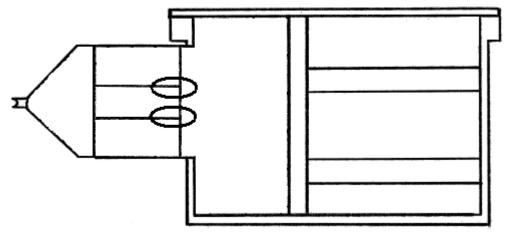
Location of the found cracks when using hardening grout. The locations are circled and orientated at the downstream interface between the core soil and grout plug.
